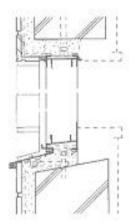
Standard Detail of Opening on External Wall (Japan) [14].
